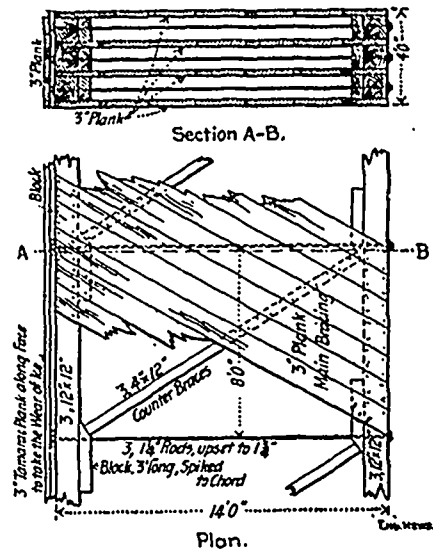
HOWE TRUSS FORMING BOOM ACROSS HEAD RACE.
